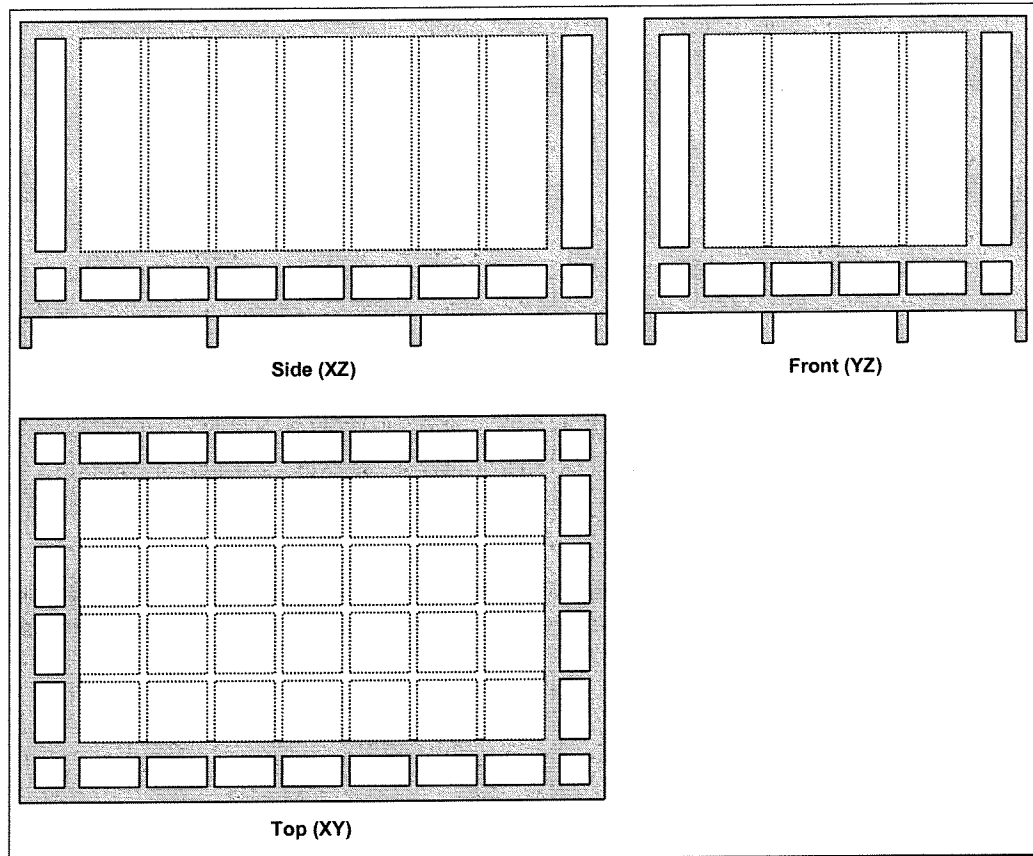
Sketch of structural concept of caisson (not on scale)
